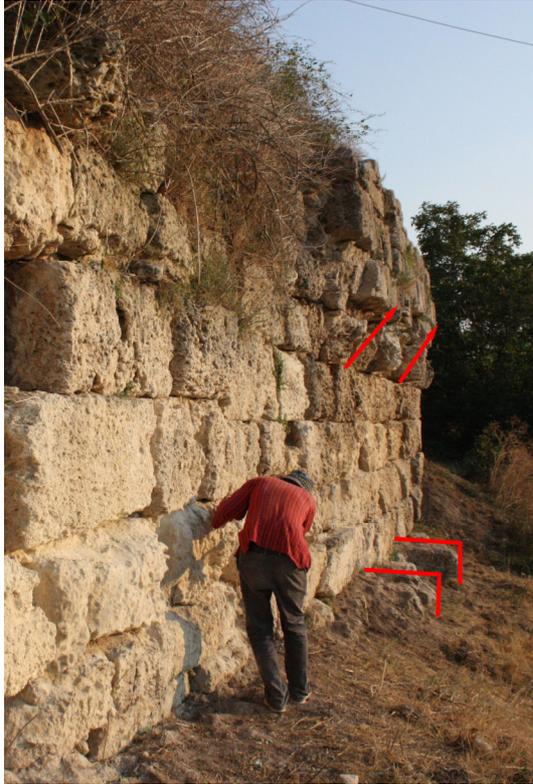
W1.1, street façade showing the projecting upper stones and the plinth, photo by author (2011).
